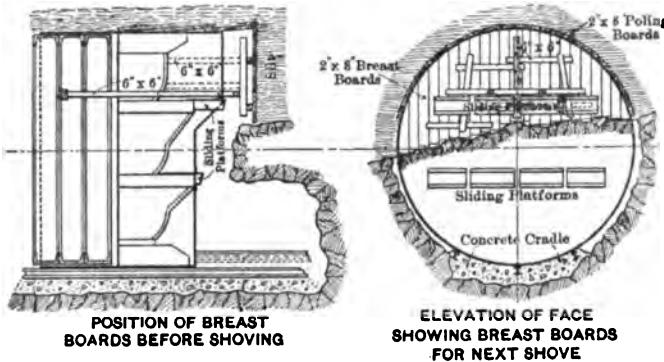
Work in mixed face (rock in bottom and silt above). Pennsylvania Railroad Hudson River Tunnels (A-18). (From *Trans. Am. Soc. C. E.*, vol. 68.)
